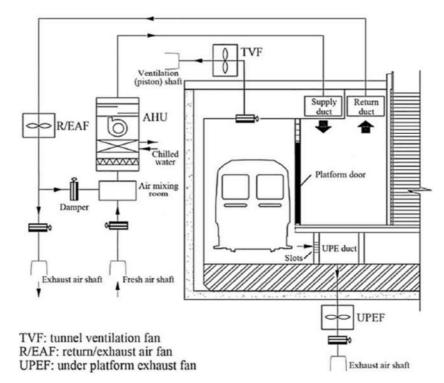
Schematic diagram of a typical heating, ventilation, and air conditioning system in underground metro stations [17].
